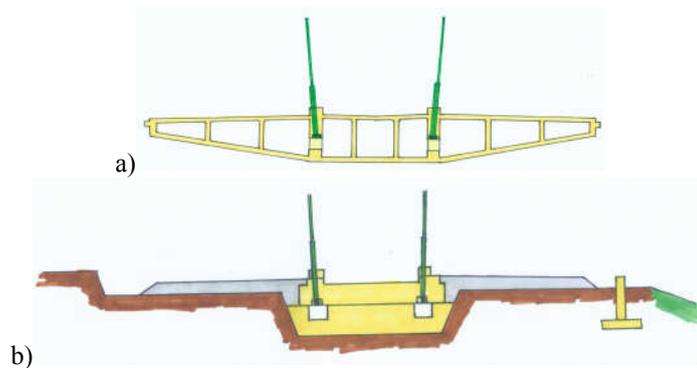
Stiffening organisation in back span: a) concrete deck / b) ground approach
